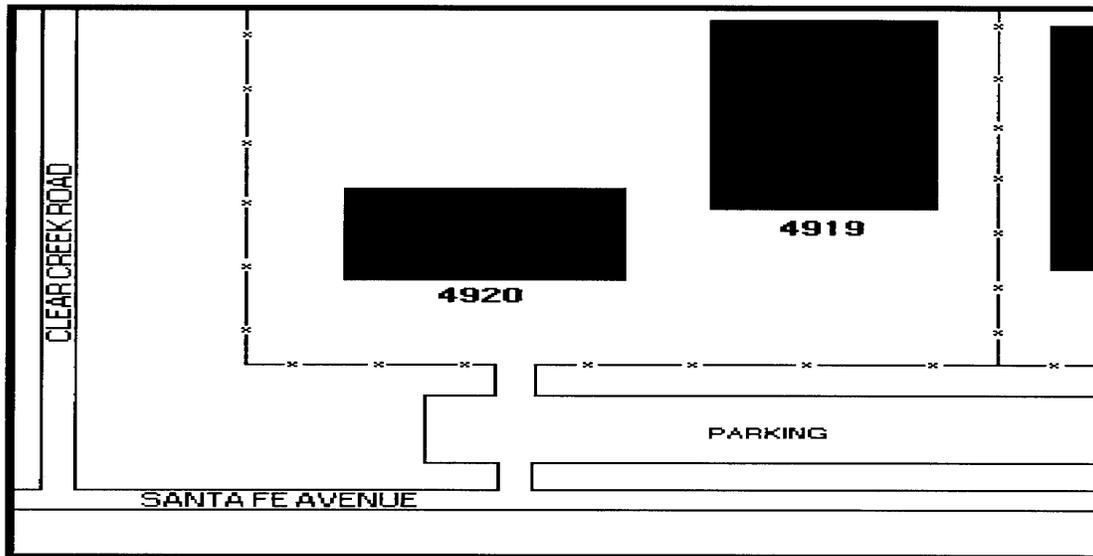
HAZMAT Storage (HAZMART) Building 4919
